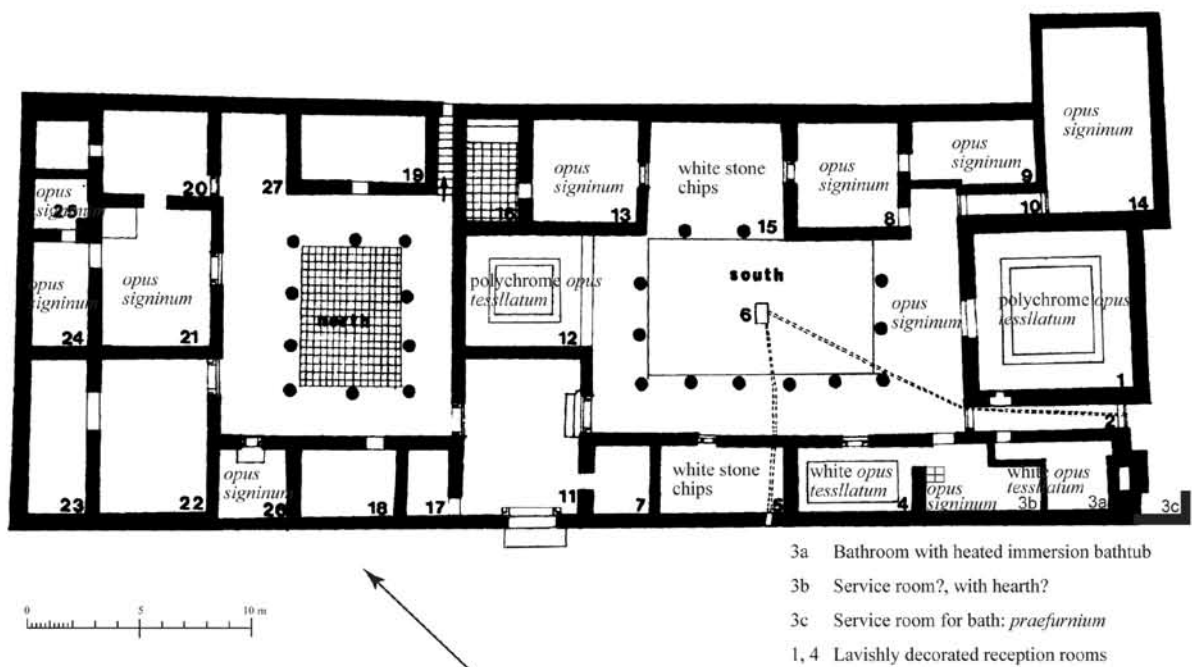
Morgantina, House of the arched cistern: plan of the building after 211 BC
